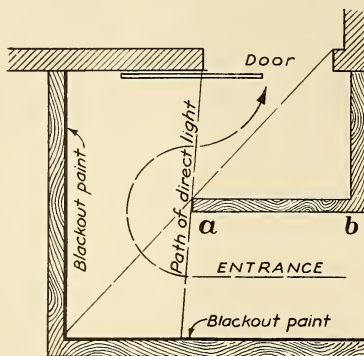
Floor plan of light-locked entrance for milk house or barn.
